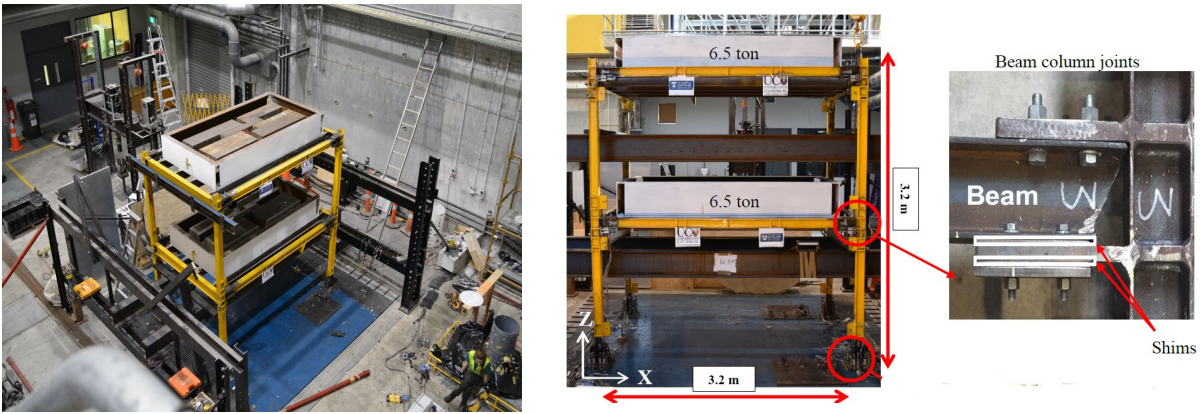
Test building constructed frame. Two steel frames with asymmetric friction connections (AFC) in the column base and beam-to-column joints.
